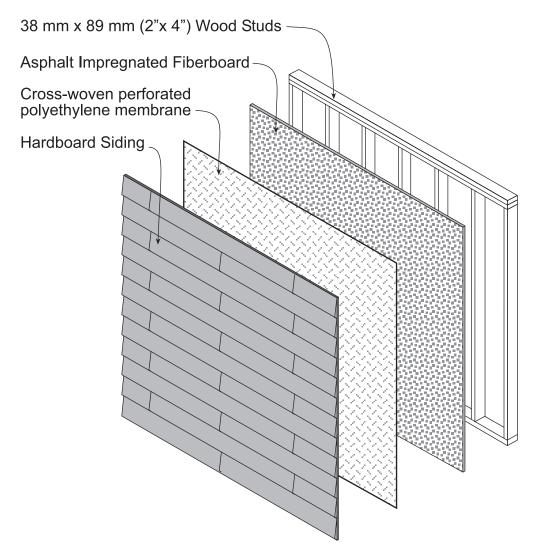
Composition of hardboard siding wall specimen No. 15
